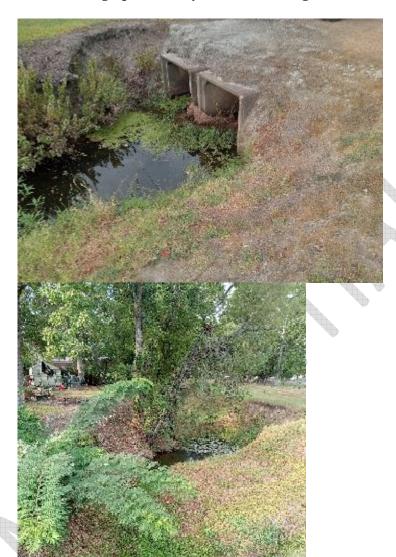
Just East of Madeline Street the Culvers open up into a wide ditch flowing southwest that becomes HCFCD Segment G103-03-00. Photo faces SW
